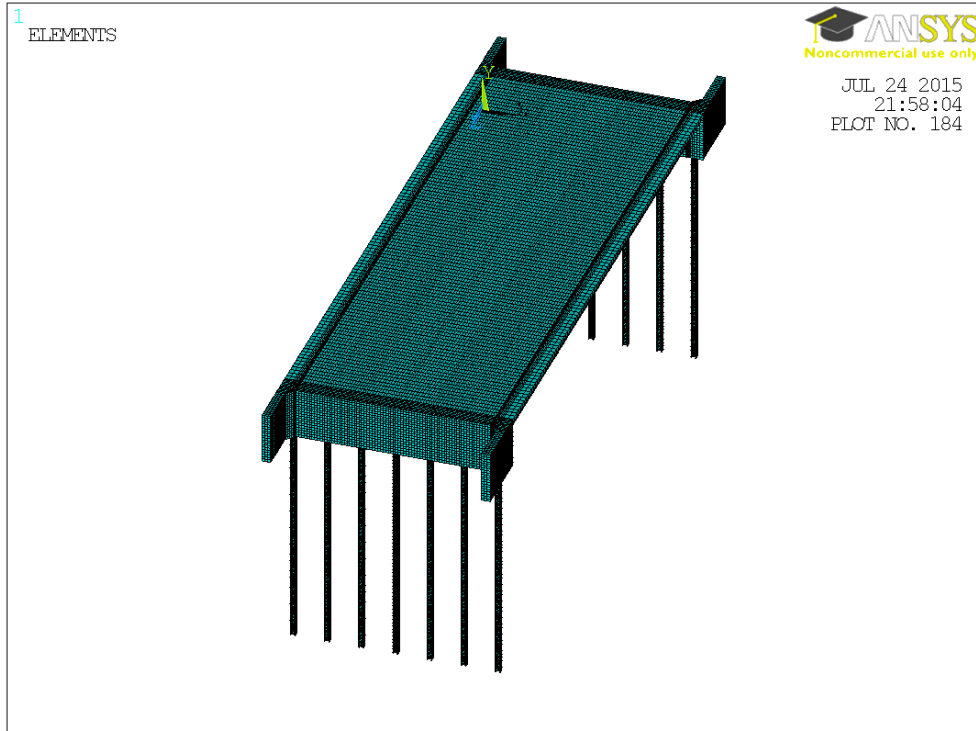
Finite element model of an integral abutment bridge with U-shaped cantilever wingwalls
